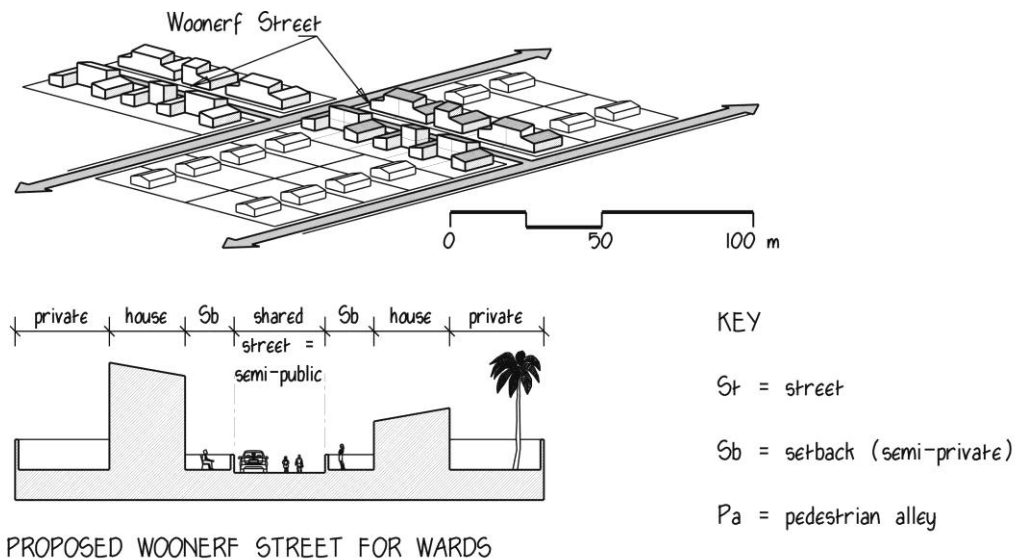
Proposed street configurations and their edges (Drawing by the author)
